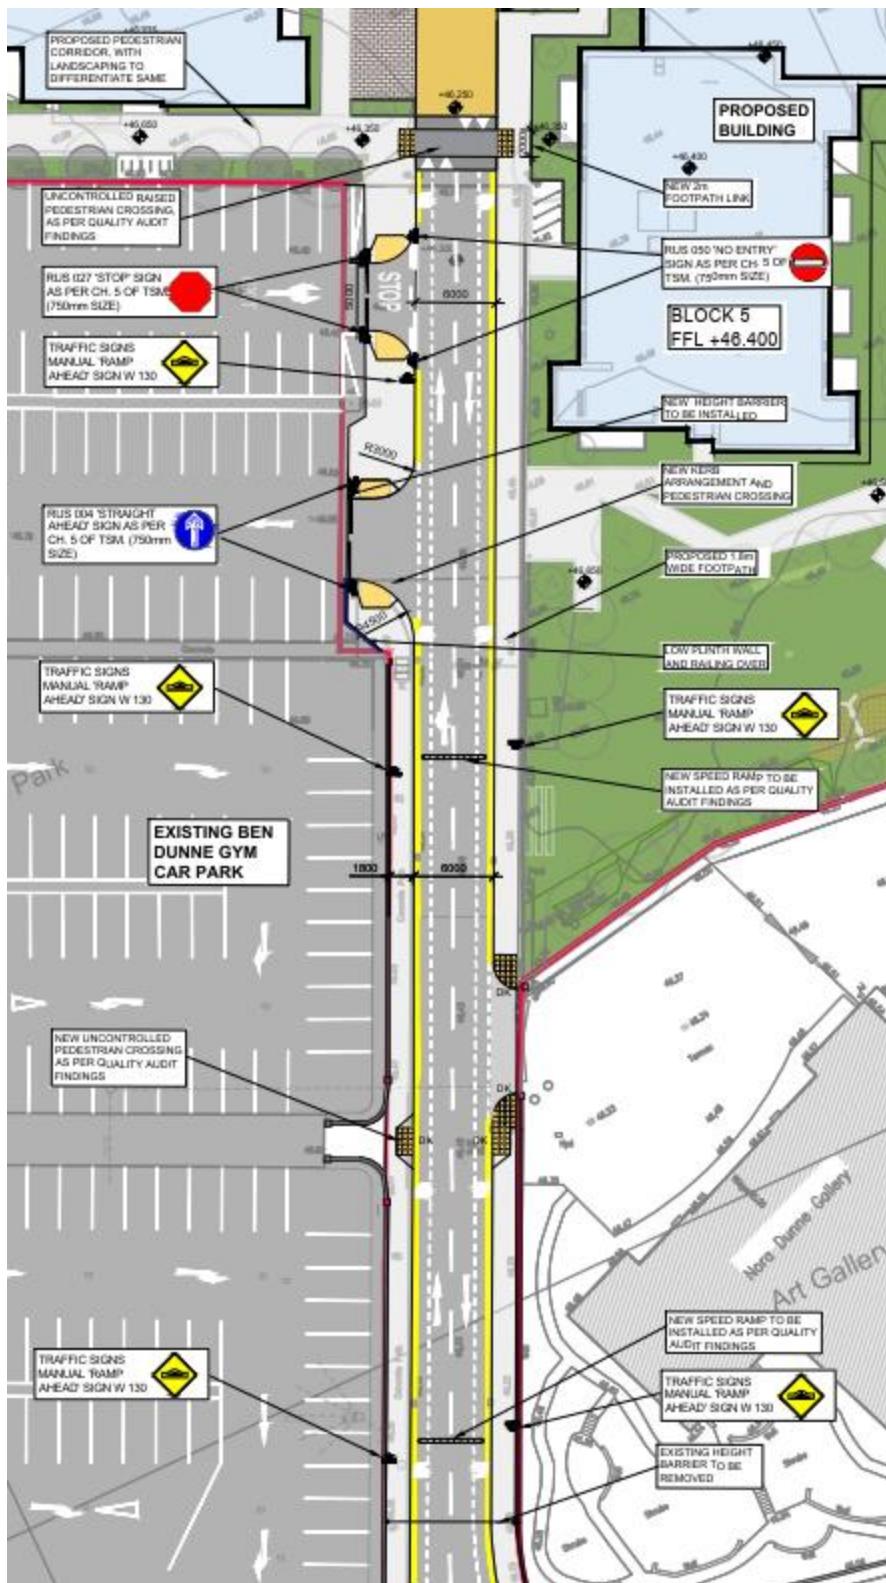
Updated Access Road Layout with traffic calming measures
